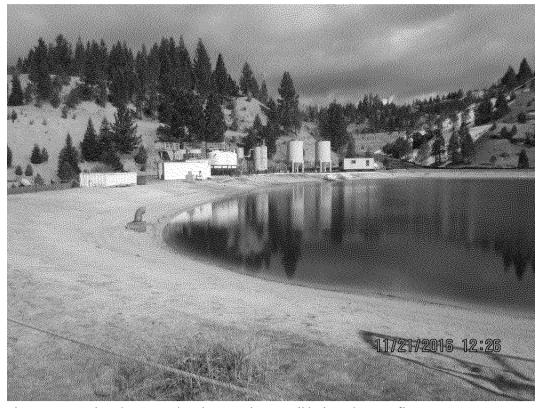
Pond 1, the water level in Pond 1 is well below the overflow structure
